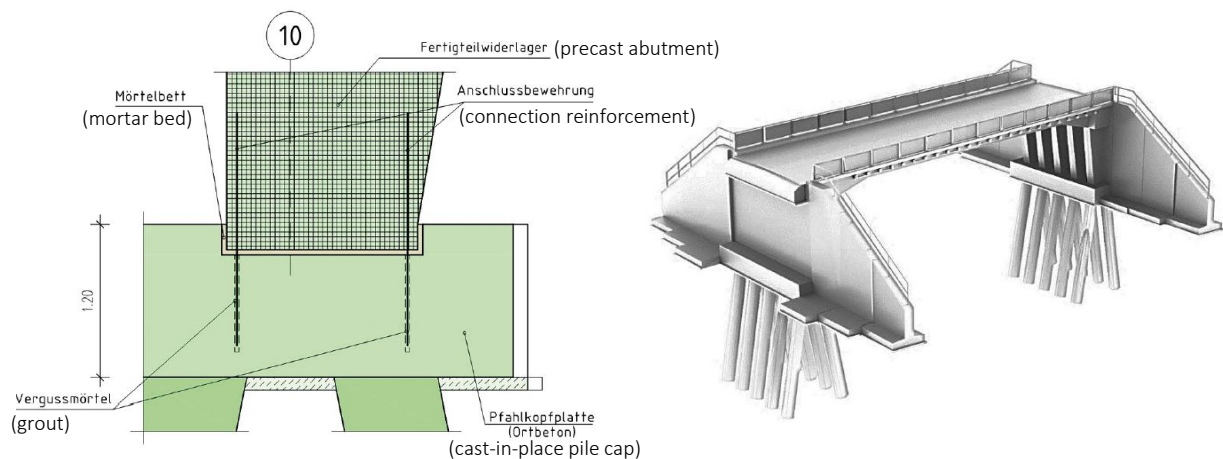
Connection between Abutment Cap and Abutment Stem [U4]
